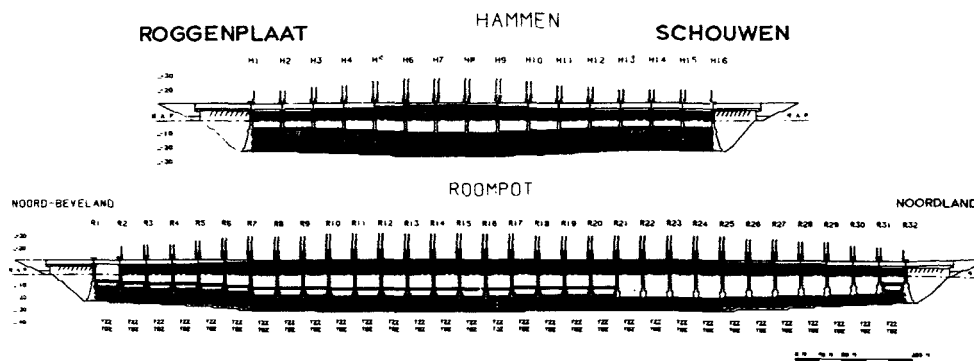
Cross-section of the barrier under construction in the Roompot and the Hammen channel
